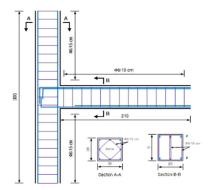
Geometry and reinforcement detailing of the beam-column joints model
